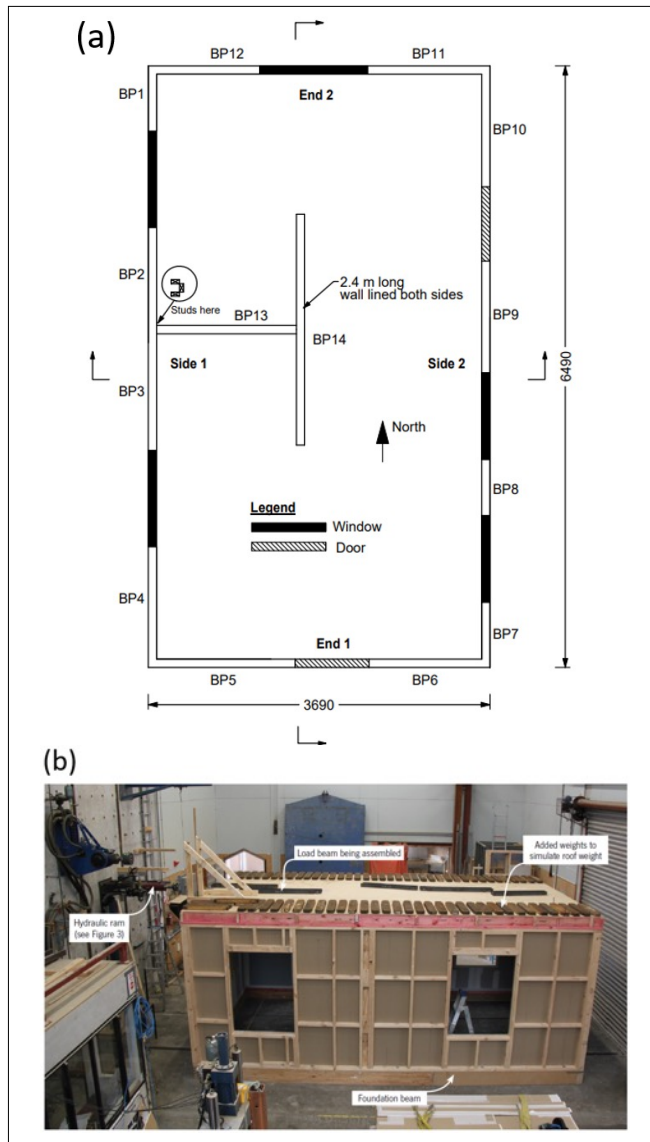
Test building [41]: (a) plan view; (b) test setup.
